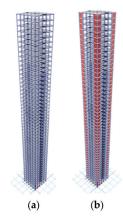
(a) G + 50 Framed Structure 3D Model Case-4; (b) G + 50 shear wall without opening 3D Model Case-5.
